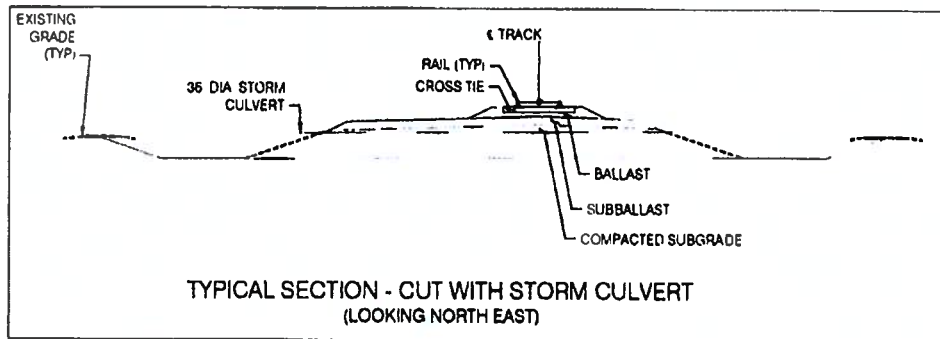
Typical cross section, looking straight along the rail, for rail corridor areas including storm culverts.
